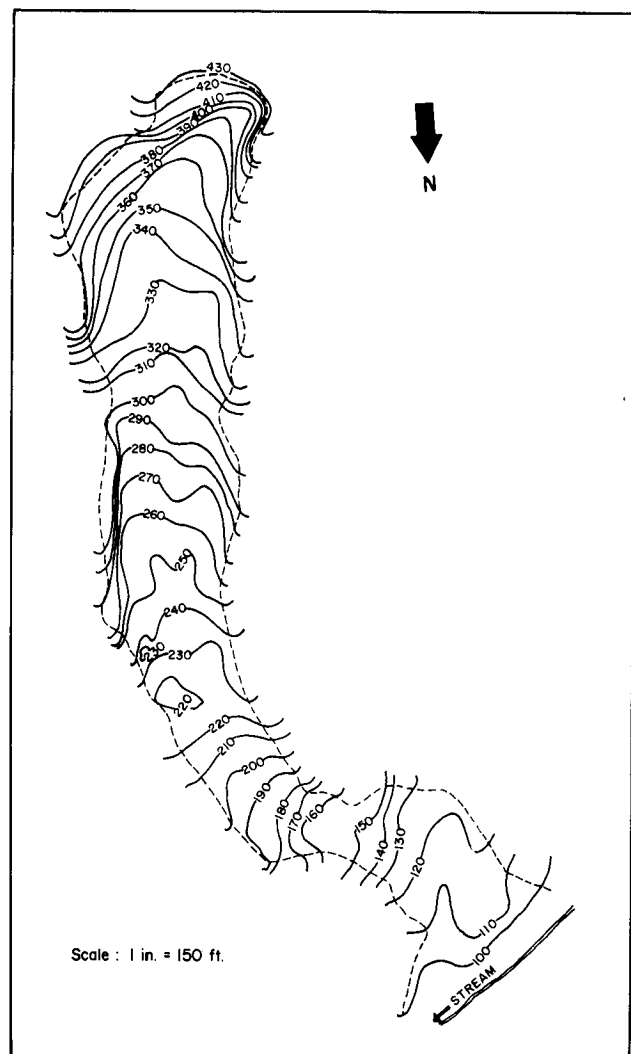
Contour plan of Slump mud-flow on Rattota Gammaduwa Road.
